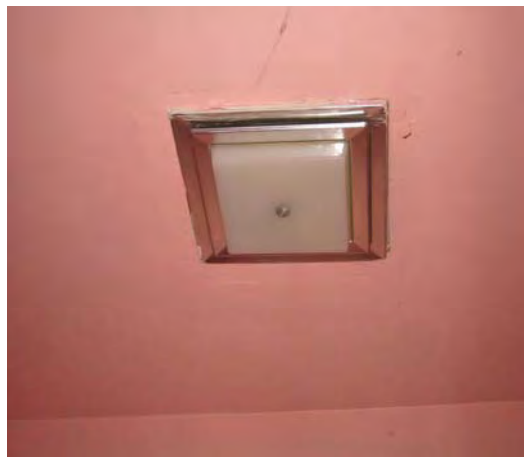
Light fixture at ceiling. (Photo: BBB, 2007)
